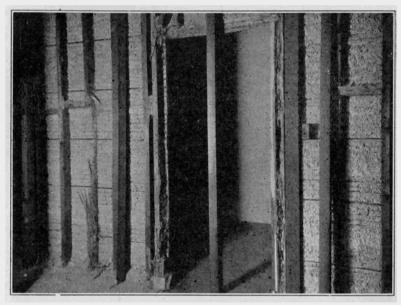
Termite damage to wooden basement partition in a large masonry building. Photograph shows four pieces of temporary shoring necessary to support wooden floor above.
